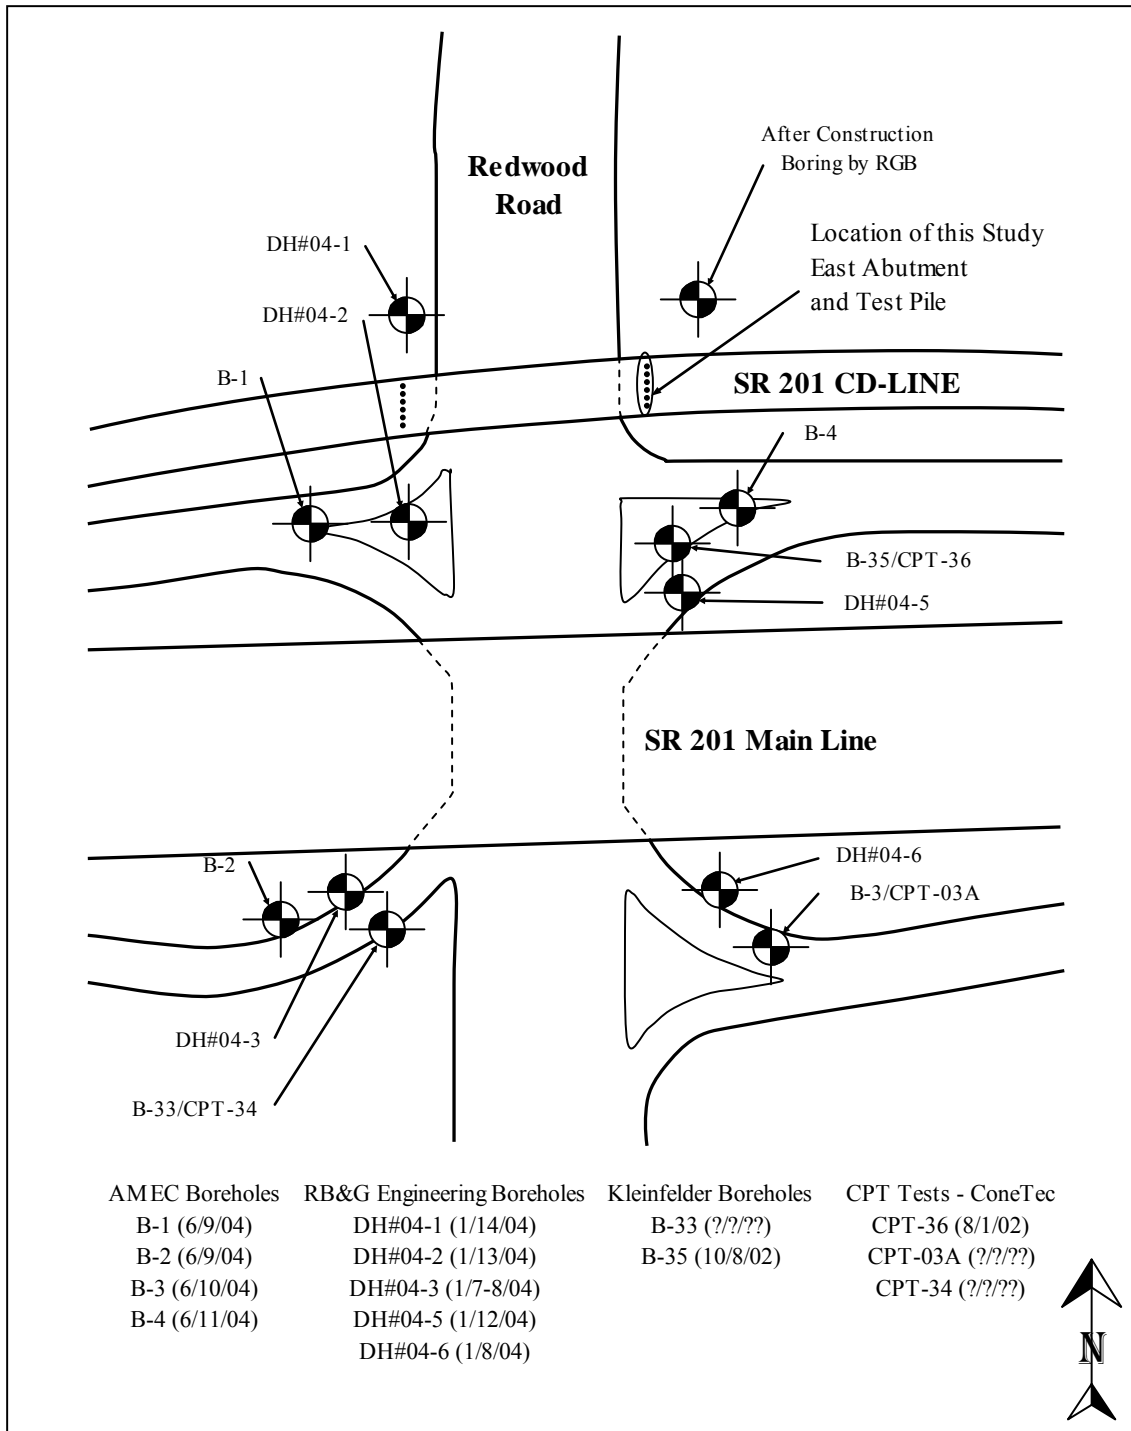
Redwood Road Site Geotechnical Boring Site Map
